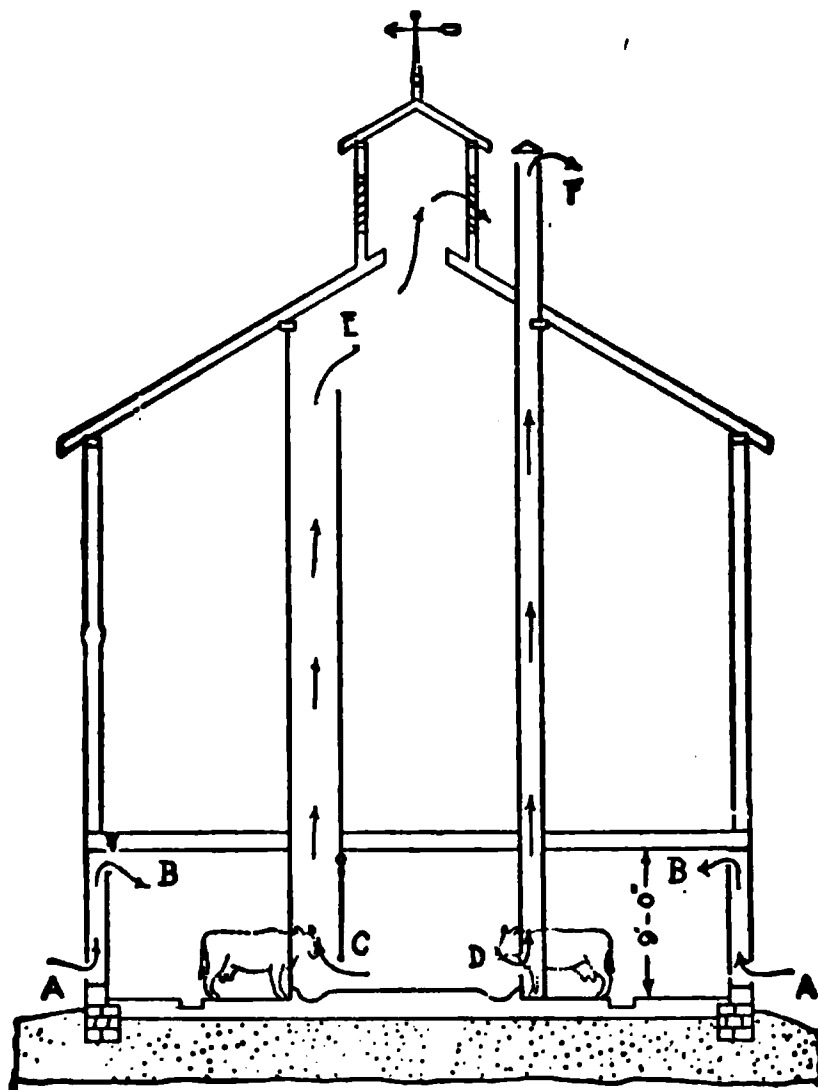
Two methods of ventilating a dairy barn. On the right the ventilating flue D F rises straight from the floor, passing out through the roof and rising above the ridge. One, two, or three of these would be used according to number of cattle. The flues should be at one or the other side of the cupola rather than behind it. On the left C E represents how a hay shoot may be used also for ventilating flue. In each of these cases the ventilating flue would take the place of one cow. This method would give the best ventilation but has the objection of occupying valuable space. C, in the feed shoot, is a door which swings out when hay is being thrown down, but is closed when used as a ventilator, the door not reaching quite to the floor. To take air into this stable if it is built of wood with studding, openings would be left at A about 4x12 inches every twelve to sixteen feet, and the air would enter and rise between the sheathing of the inside and the siding on the outside, entering at B as represented by the arrows. If the barn is a basement or stone structure the air intakes could be such as described in figures 150, 151, and 152.
